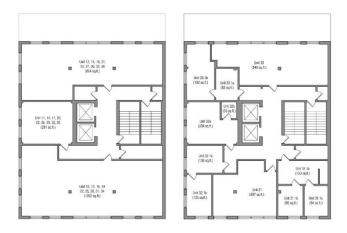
, 249 (left to right, top down): Building 8, eleventh floor (1926); same floor (1981). I'' = 32'. North is to the left.
